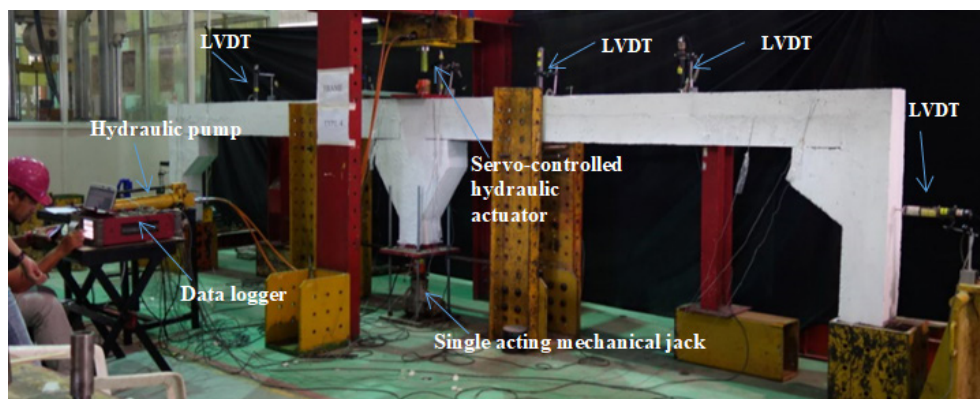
The assembly of precast concrete beam-column with the middle column supported by a single acting mechanical jack.
